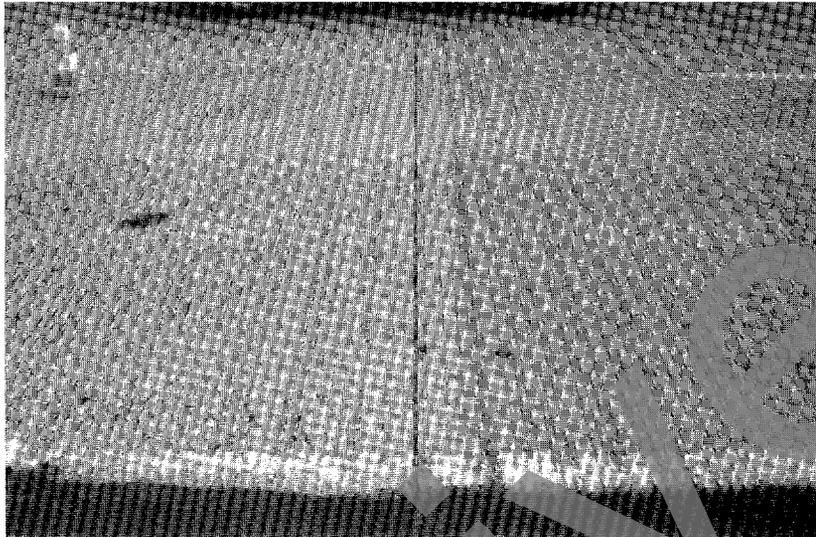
Surface and transverse tining of fiber-reinforced concrete overlay of an AC pavement in Belgium.
